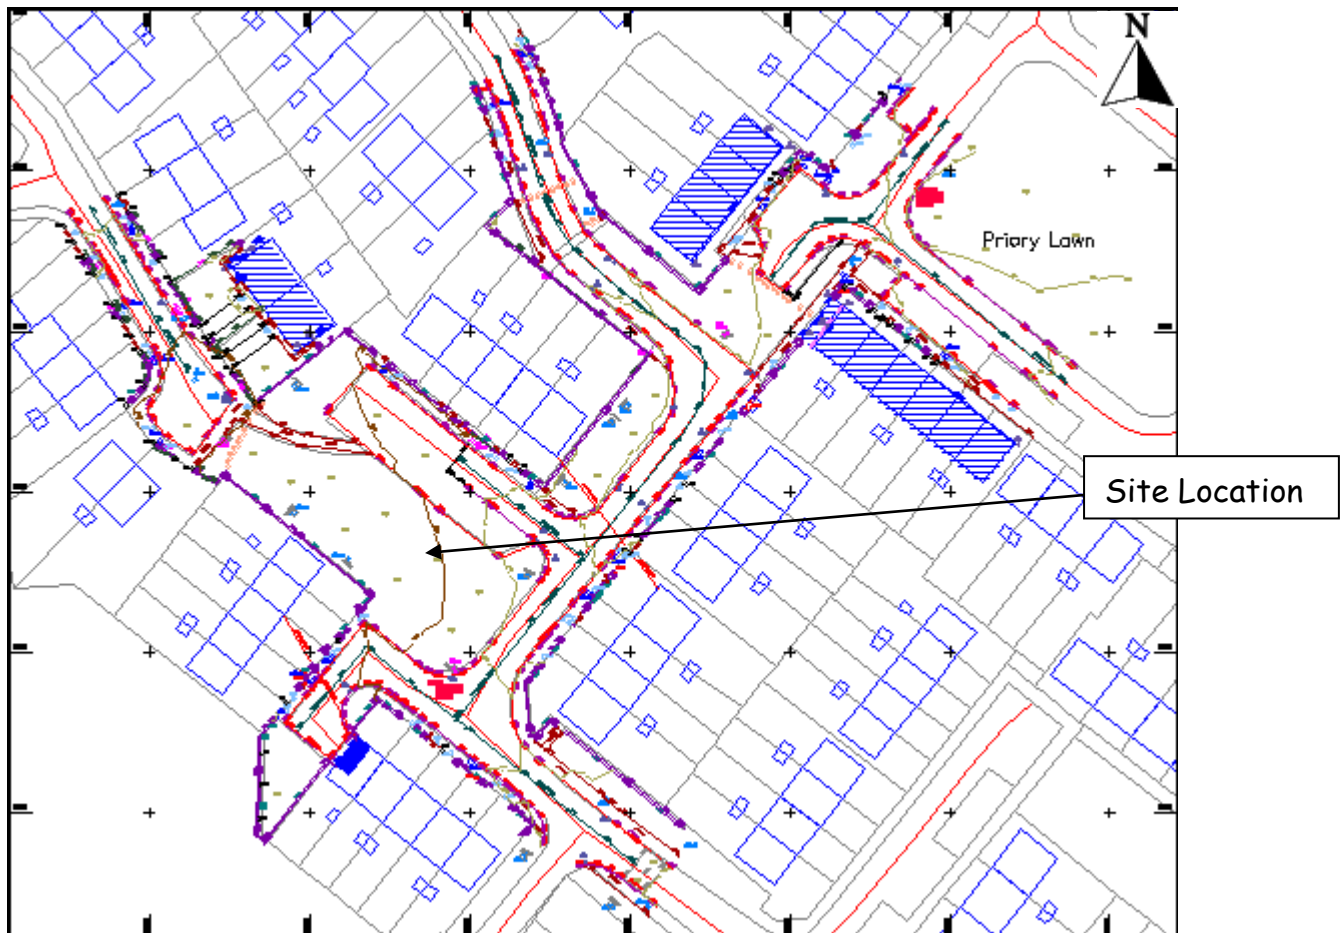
Existing Site Survey Plan. (Extract from surveys drawing)
